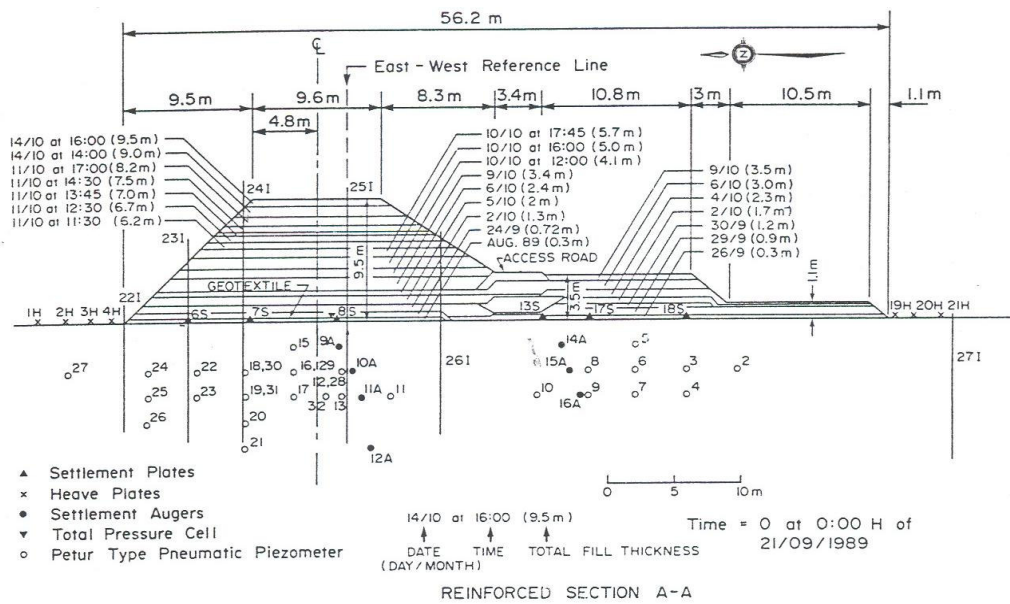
Layout of instrumentation and sequence of construction of reinforced embankment.
